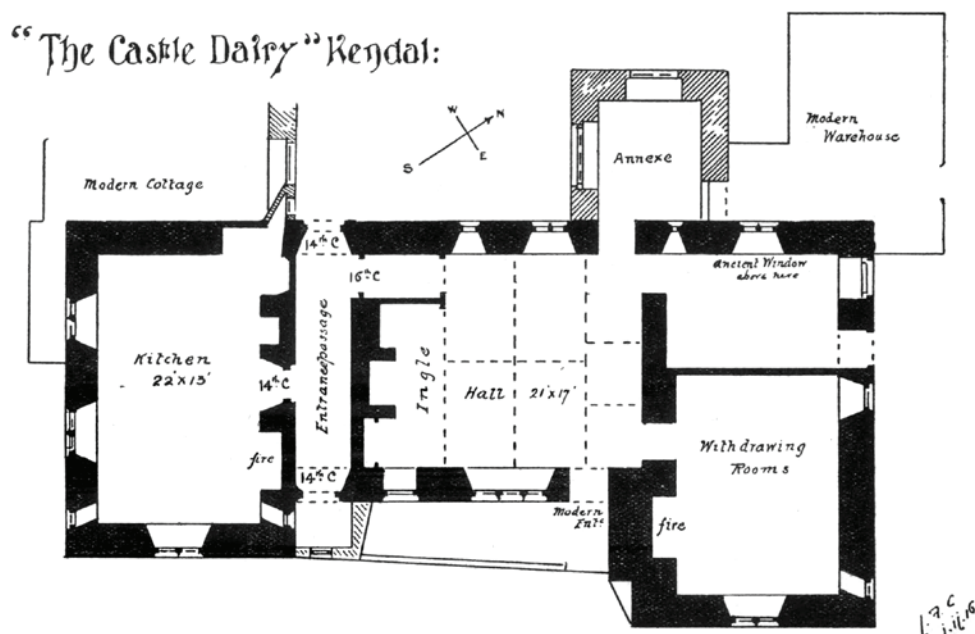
Curwen's plan of the Castle Dairy, 1916 (from Curwen 1916)
